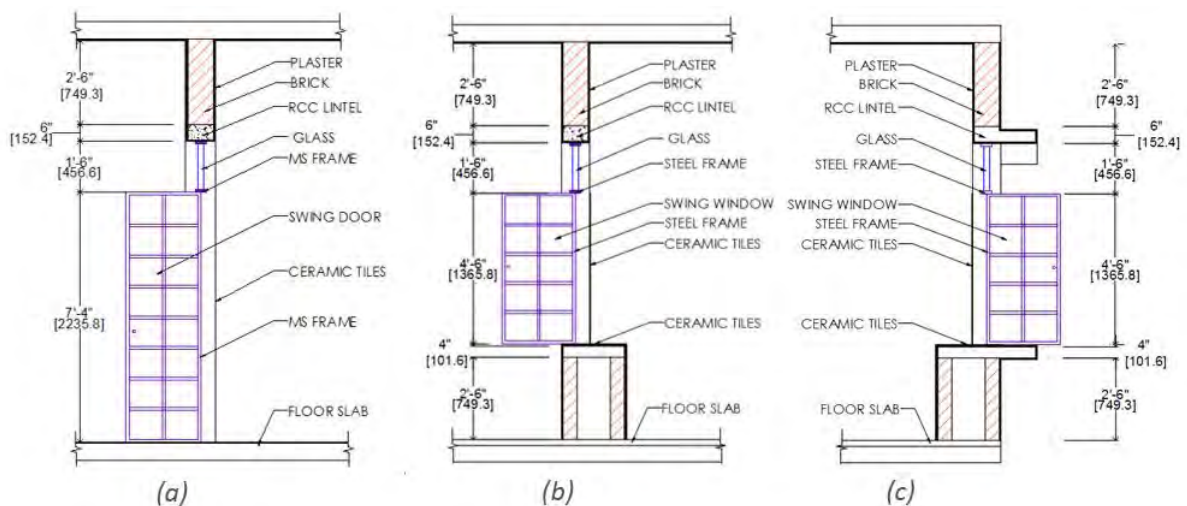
Existing envelope detail of Inpatient room of Surgery (Ward no 05). (a) Door section on corridor side (b) window section on corridor side (c) window section on exterior wall.
